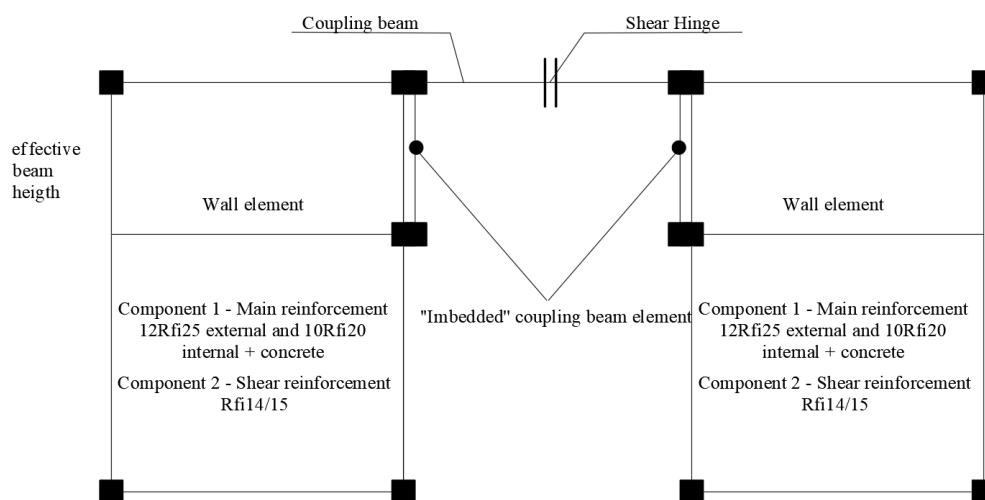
Schematic representation of nonlinear model of coupling wall on first floor
